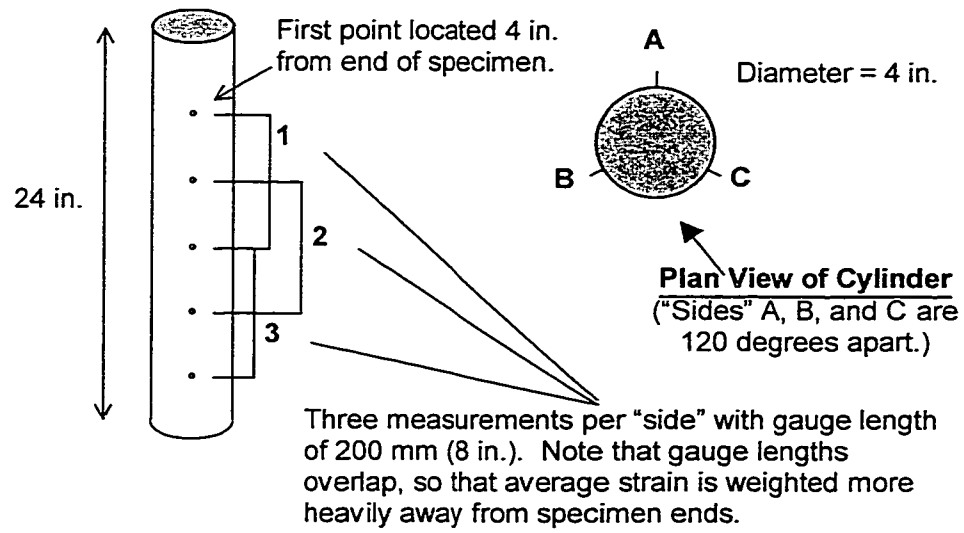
Arrangement of DEMEC Gauge Points on C/S/T Specimens
